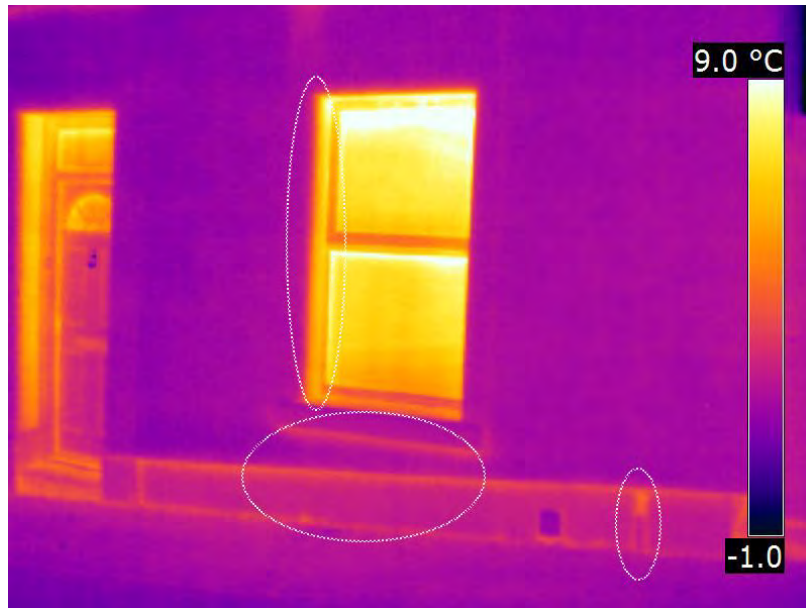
Thermal image showing small area of external wall after retrofitted EWI was installed
